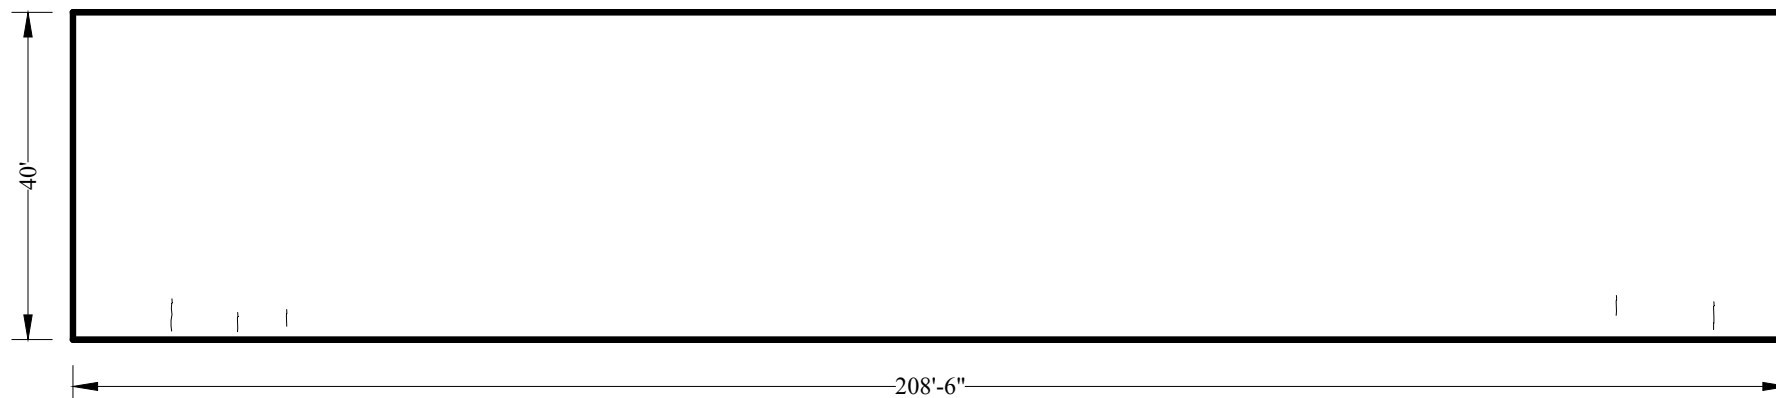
Crack Survey of A45 Concrete Bridge Deck (West Bound)
